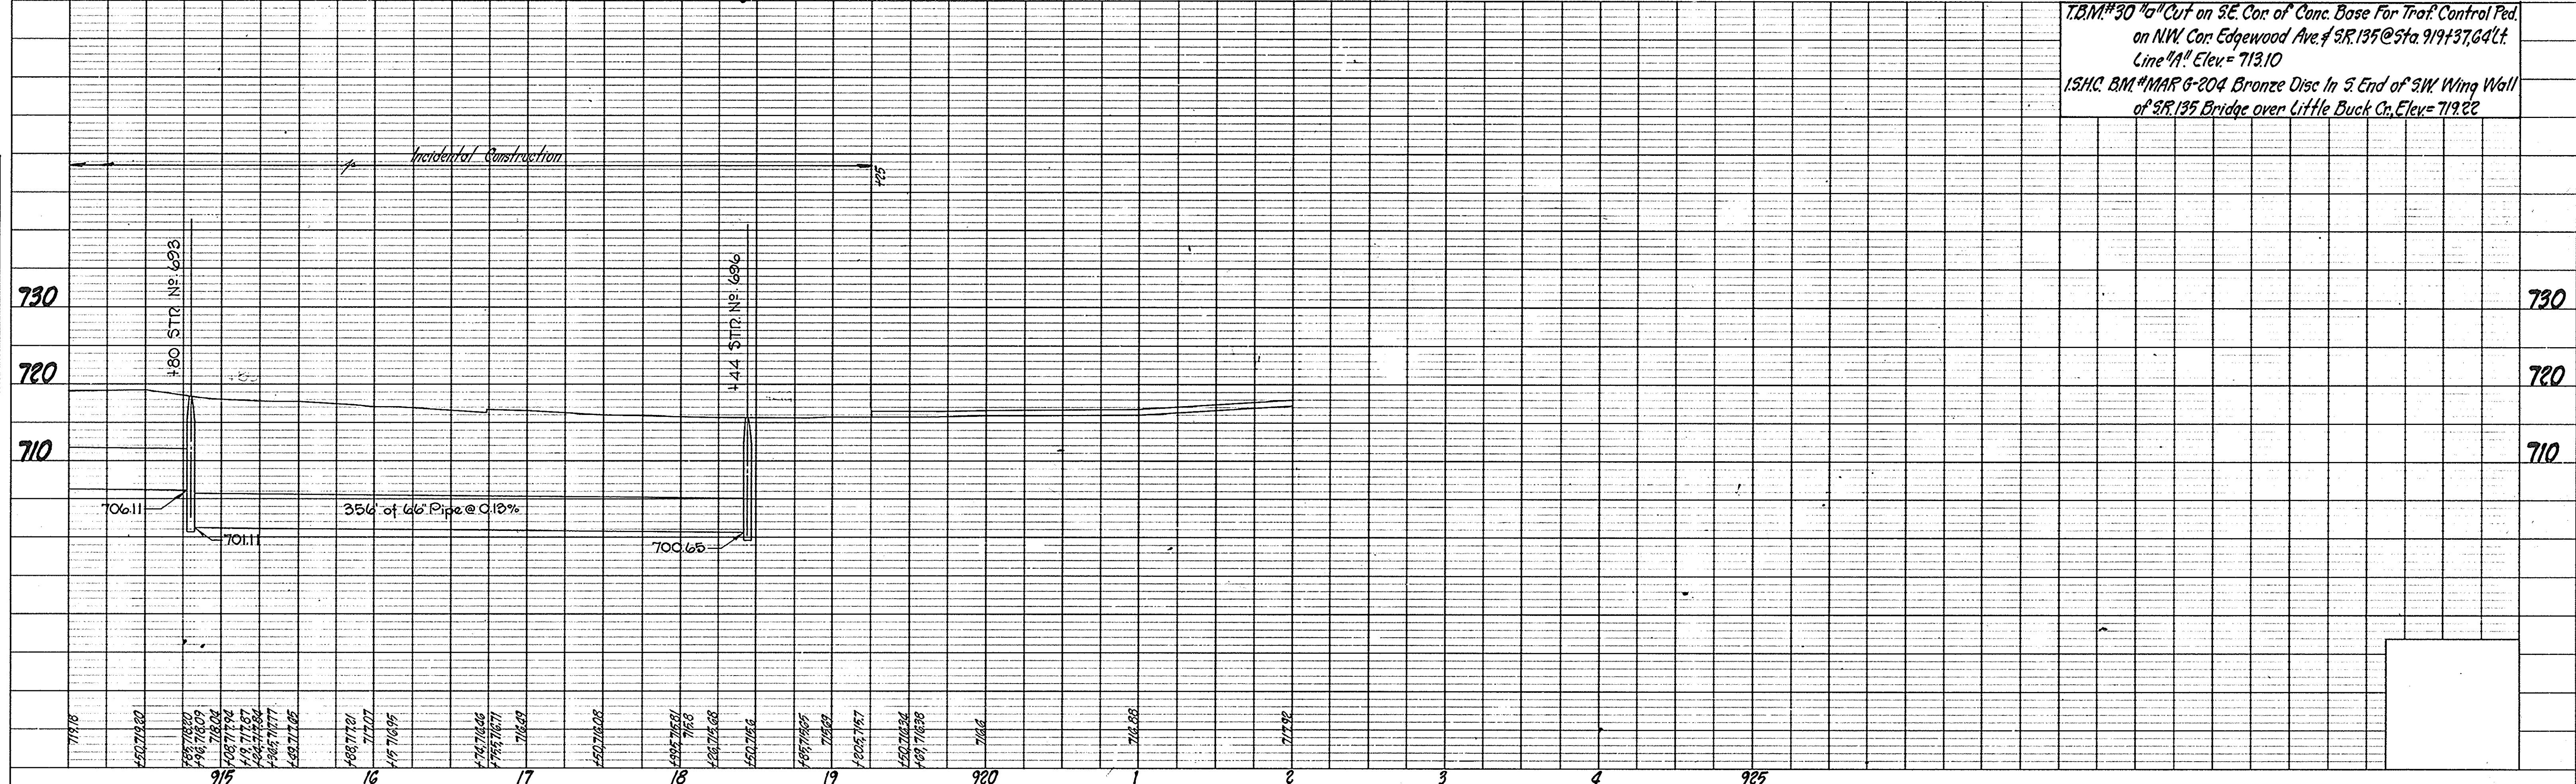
PLAN - PROFILE P. R. R. STANDARD
